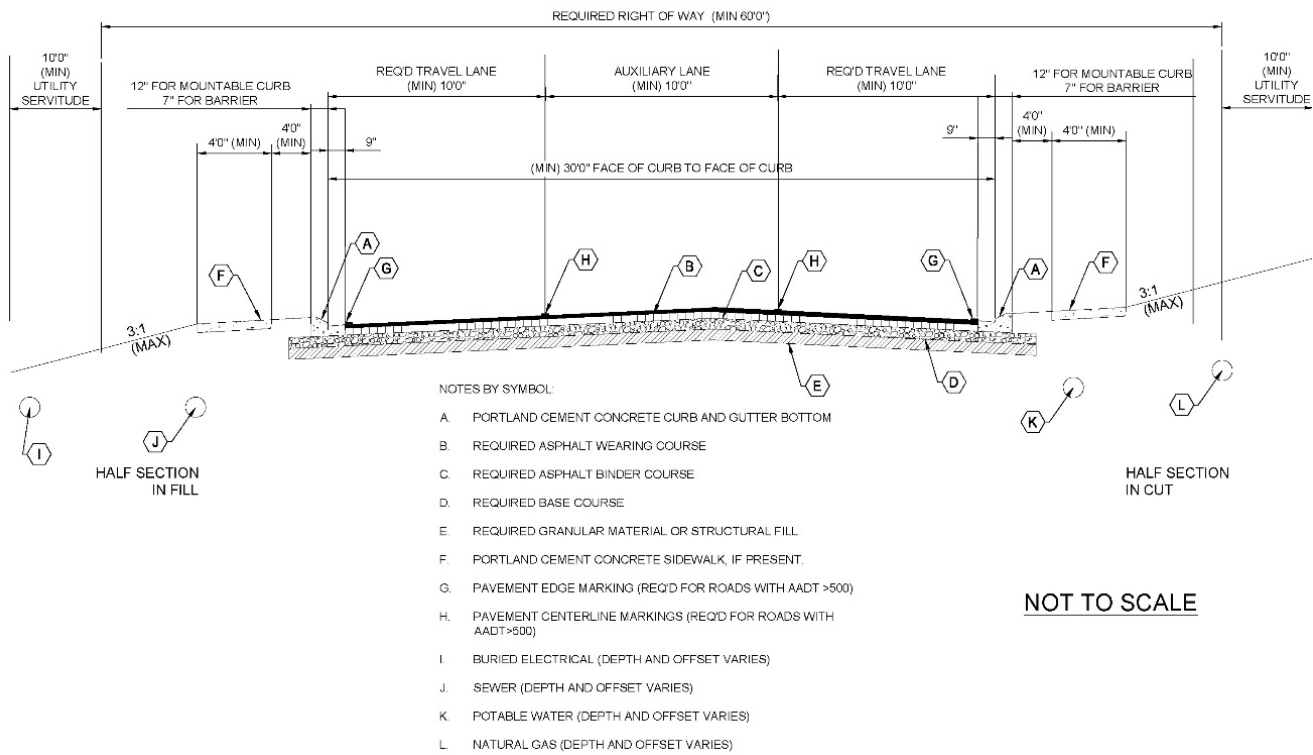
Cross Section Elements and Requirements for Curbed Roadway, 3-Lane Portland Cement Concrete Pavement.
